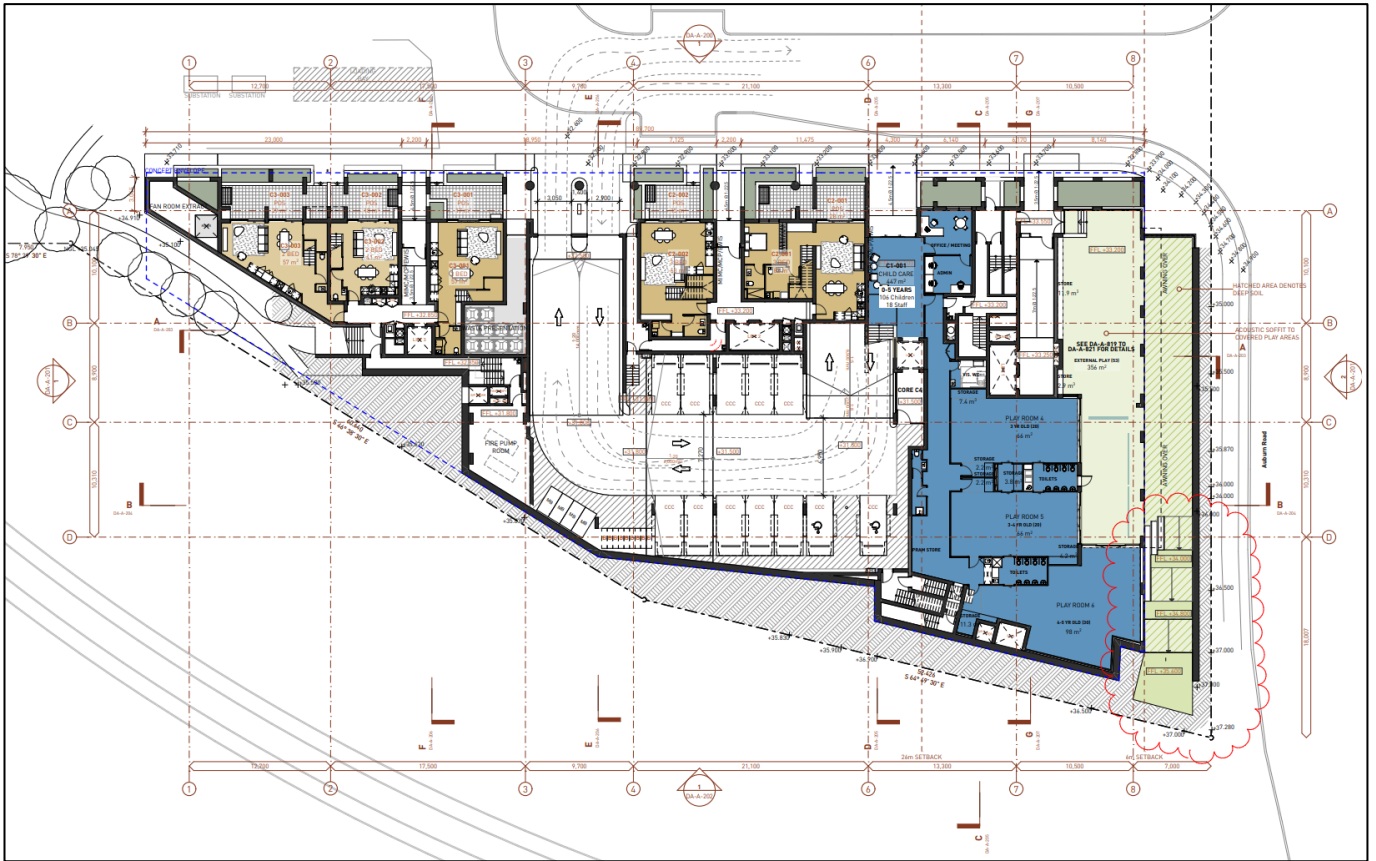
| Ground floor plan – Building C (Source: Smith & Tzannes, 2026)
